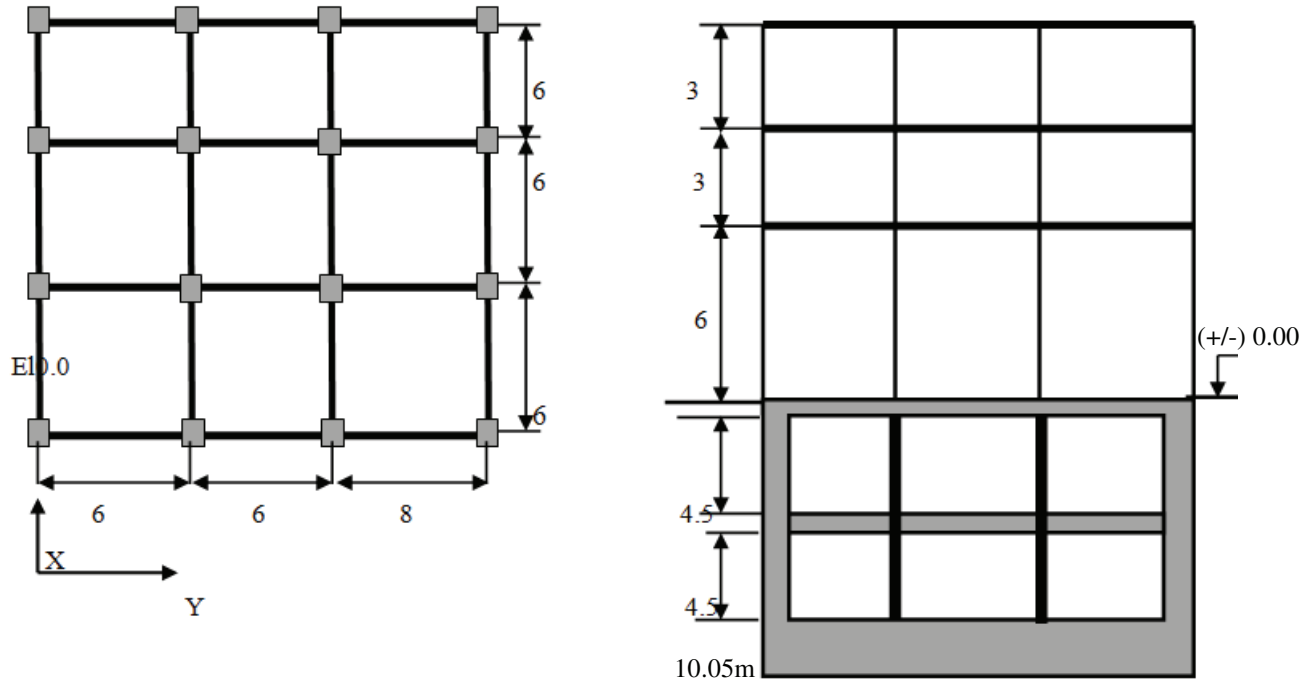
Plan and elevation of the service building complex analysed for soil structure interaction
